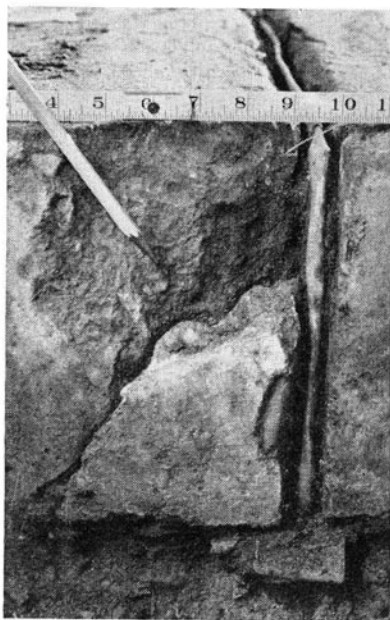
TYPICAL EXAMPLE OF FRACTURE IN EDGE OF PAVEMENT
